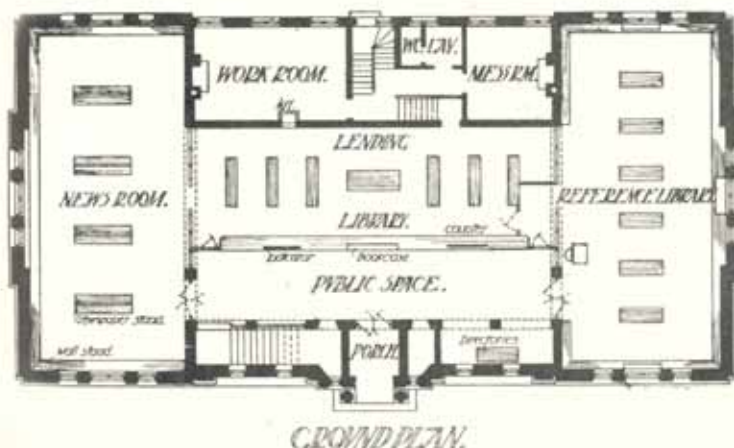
Southend Public Library—Plan of Lending Department (partial open access).
